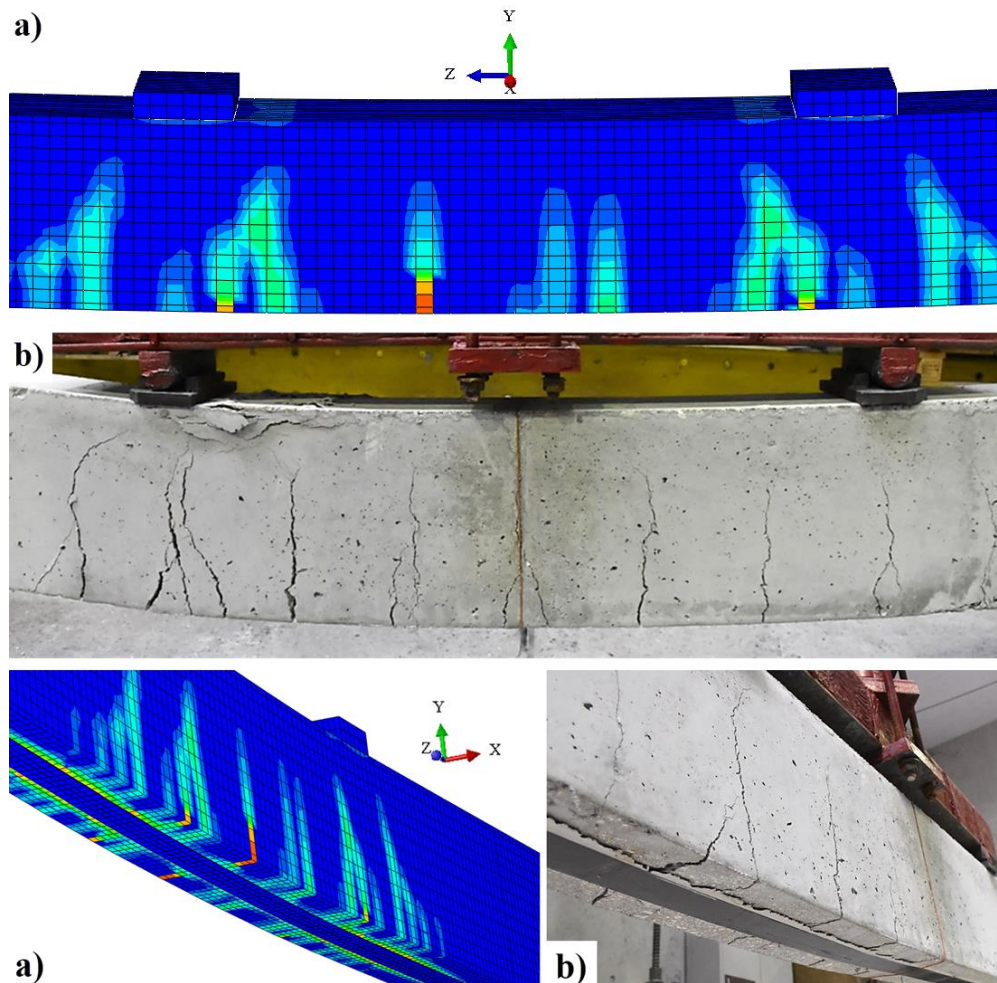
(a) Numerical (b) and experimental cracking along the cross-section of the CFRP-strengthened beam at the CFRP failure instant
